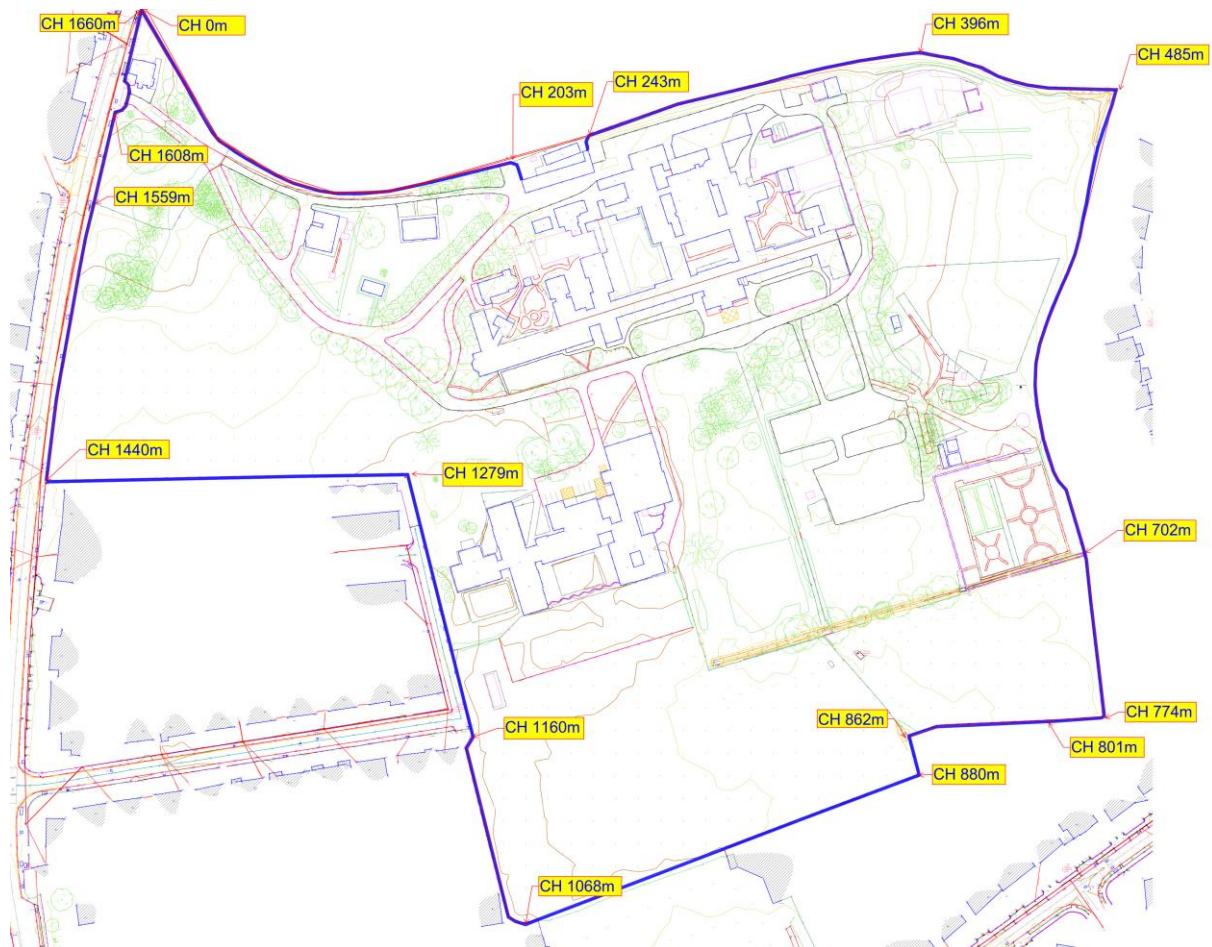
Perimeter wall plan showing chainages in metres along the wall measured from the northwest corner
